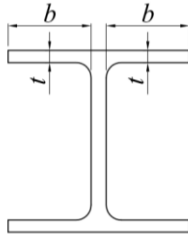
Flange of I-Shaped Cross-Section Member
